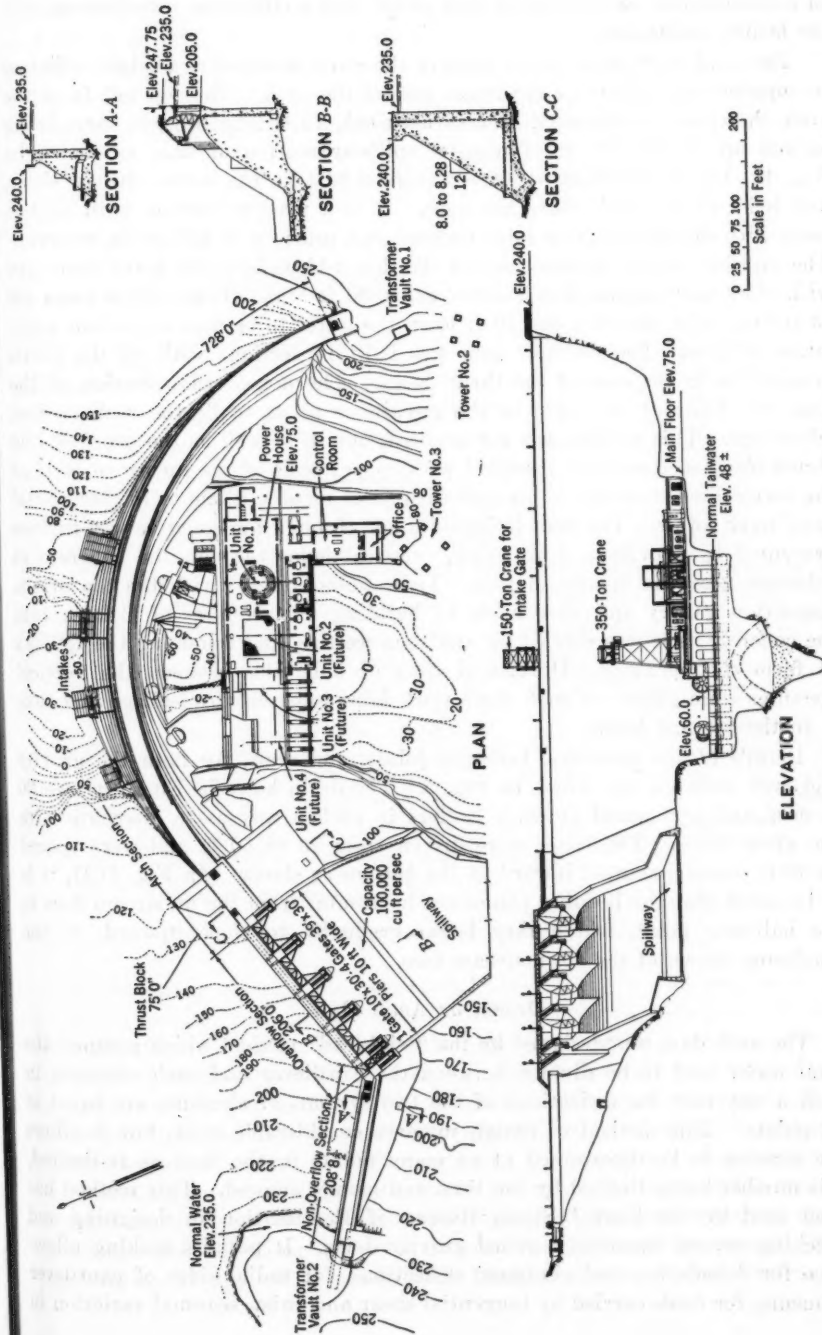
PLAN AND ELEVATION OF DAM AND POWER HOUSE.
